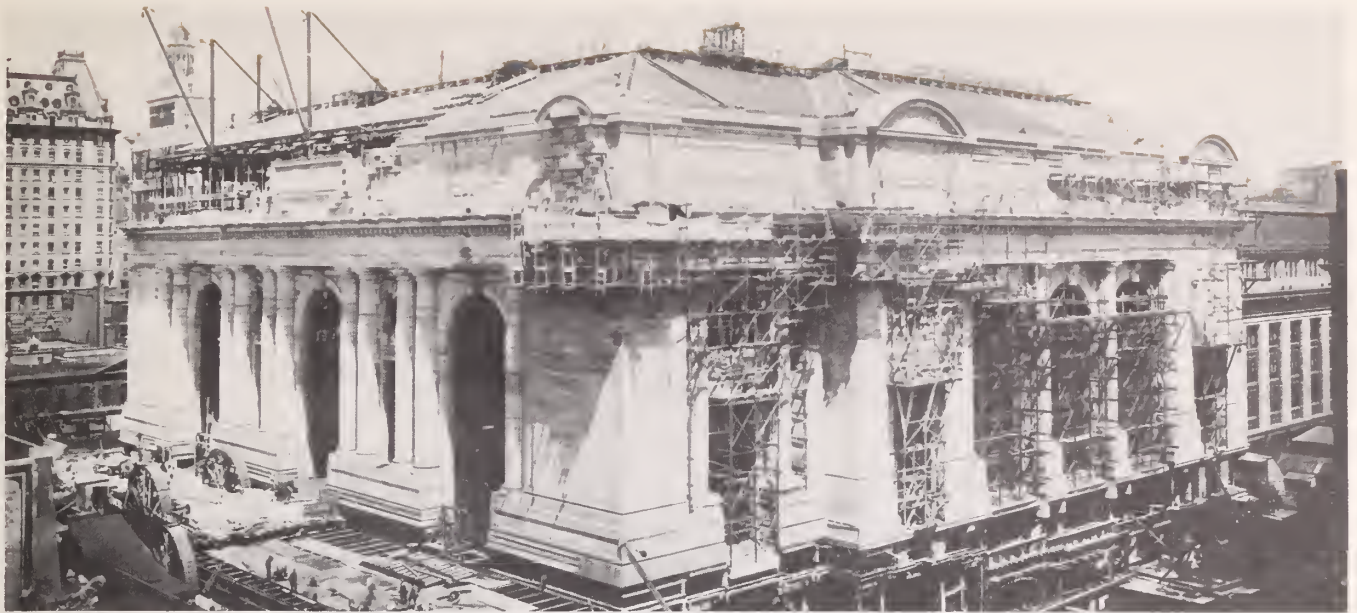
Grand Central Terminal, 1903-1913, Warren and Wetmore, architects. This 1909 view from the south of the new terminal in the Beaux Arts style shows the new elevated highway to carry Park Avenue traffic around the complex.
